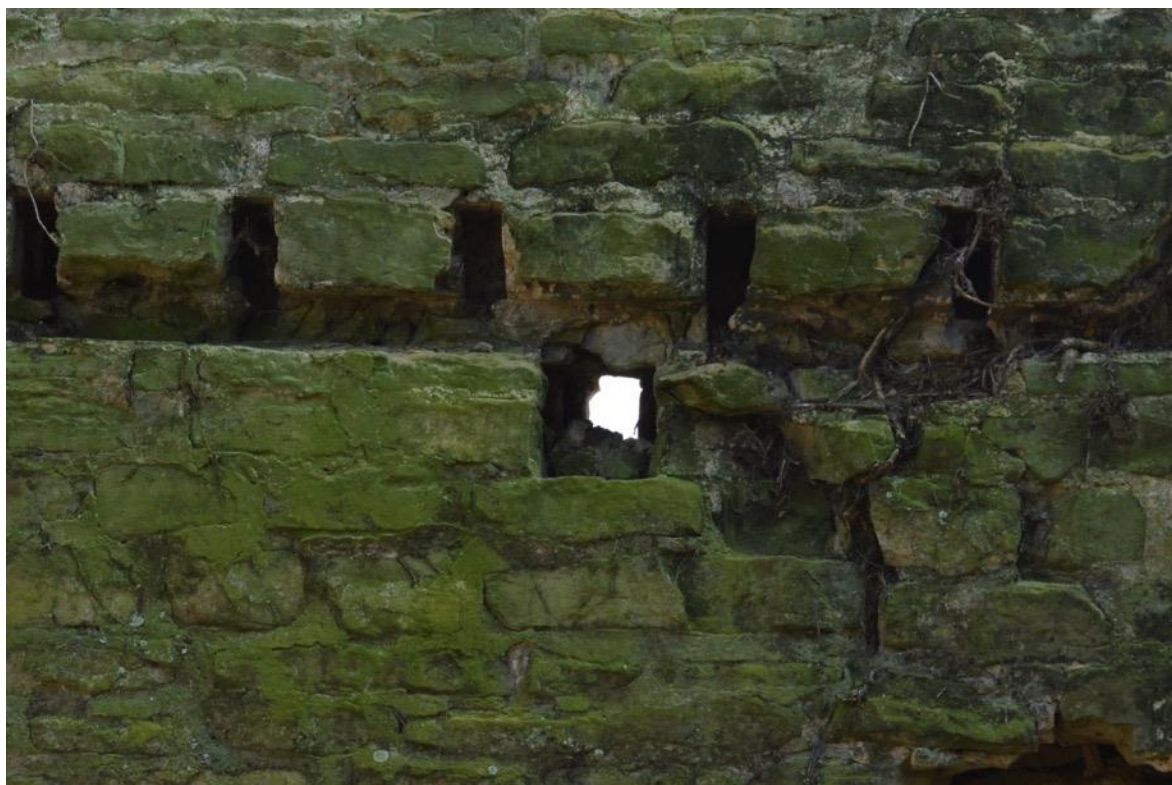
Detail of an internal wall socket used to support the loading bay floor construction, Elevation 7 interior (6948_0047)
